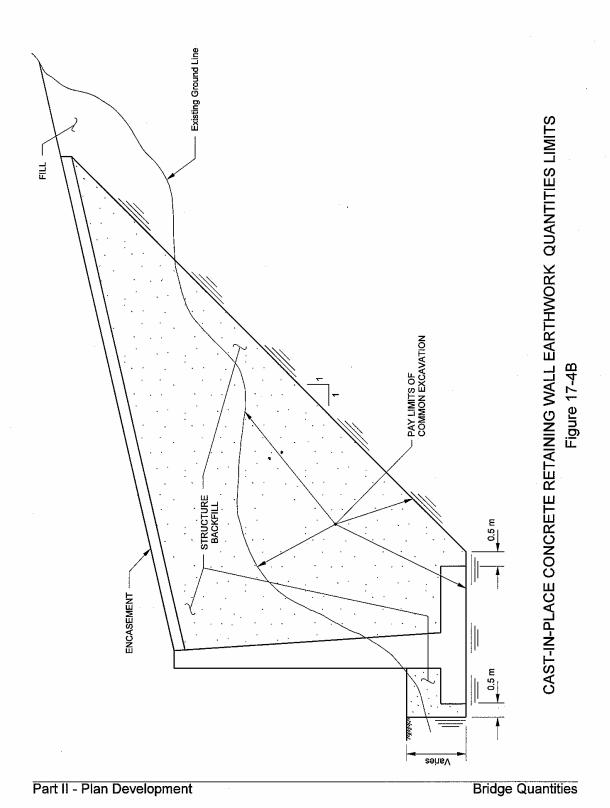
B, Cast-in-Place Concrete Retaining Wall Earthwork Quantities Limits; Figure 17-4C, MSE Retaining Wall Earthwork Quantities Limits; and Figure 17-4D, MSE Retaining Wall Earthwork Quantities Limits Showing Foundation Treatment, each illustrate the typical pay limits for excavation and backfill material quantities for retaining walls. The contractor may select an alternate wall design. However, the earthwork quantities should be calculated based on the outermost neat-line construction limits for the wall type shown on the plans.
